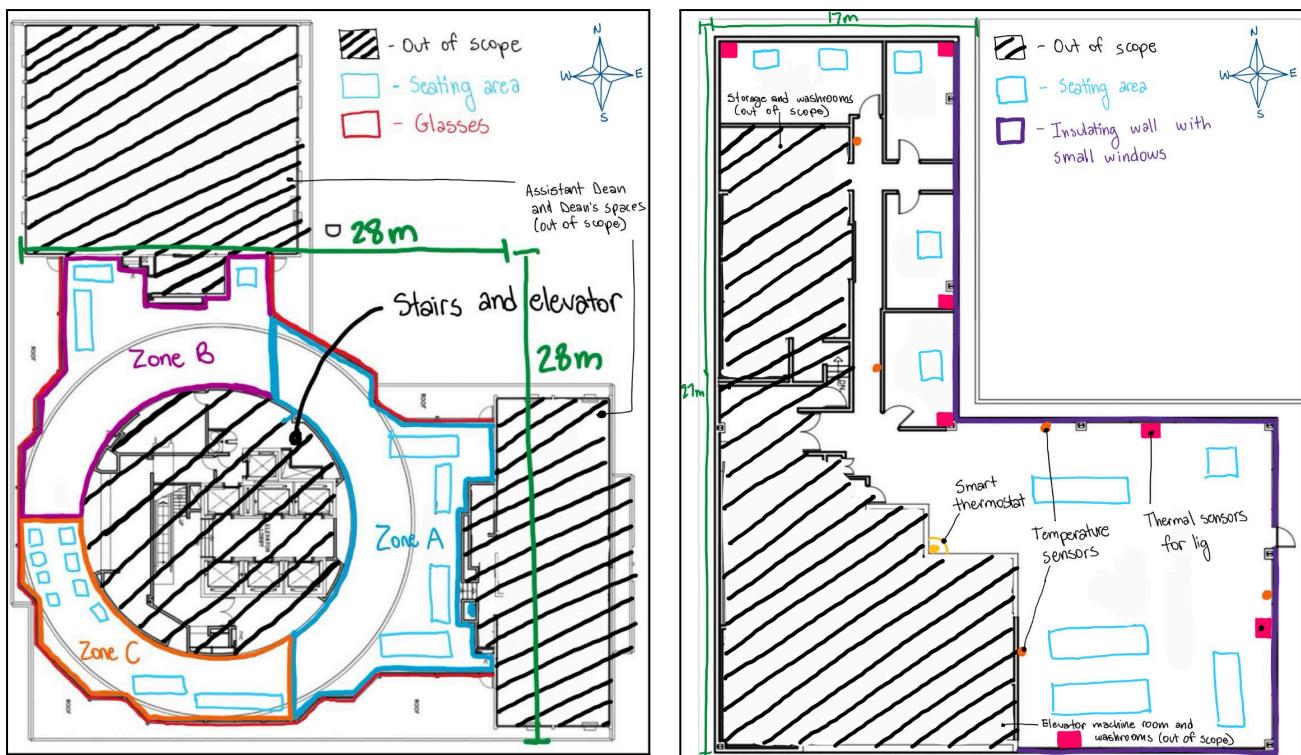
Floor Plans for the 27th (left) and 28th (right) floor.
